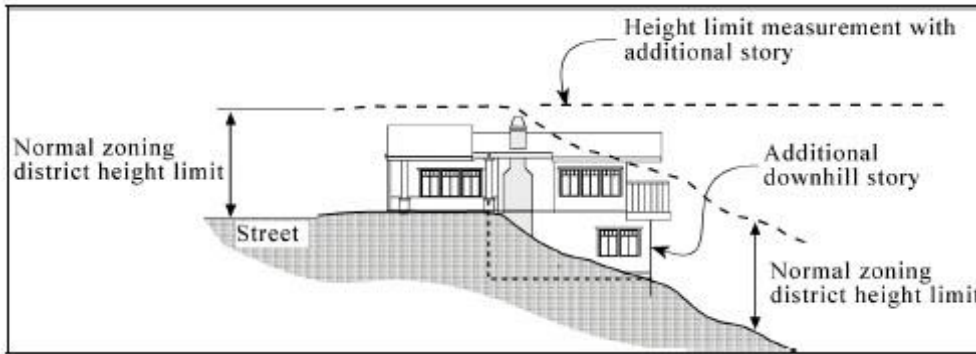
ADDITIONAL BUILDING HEIGHT ON DOWNHILL LOT
